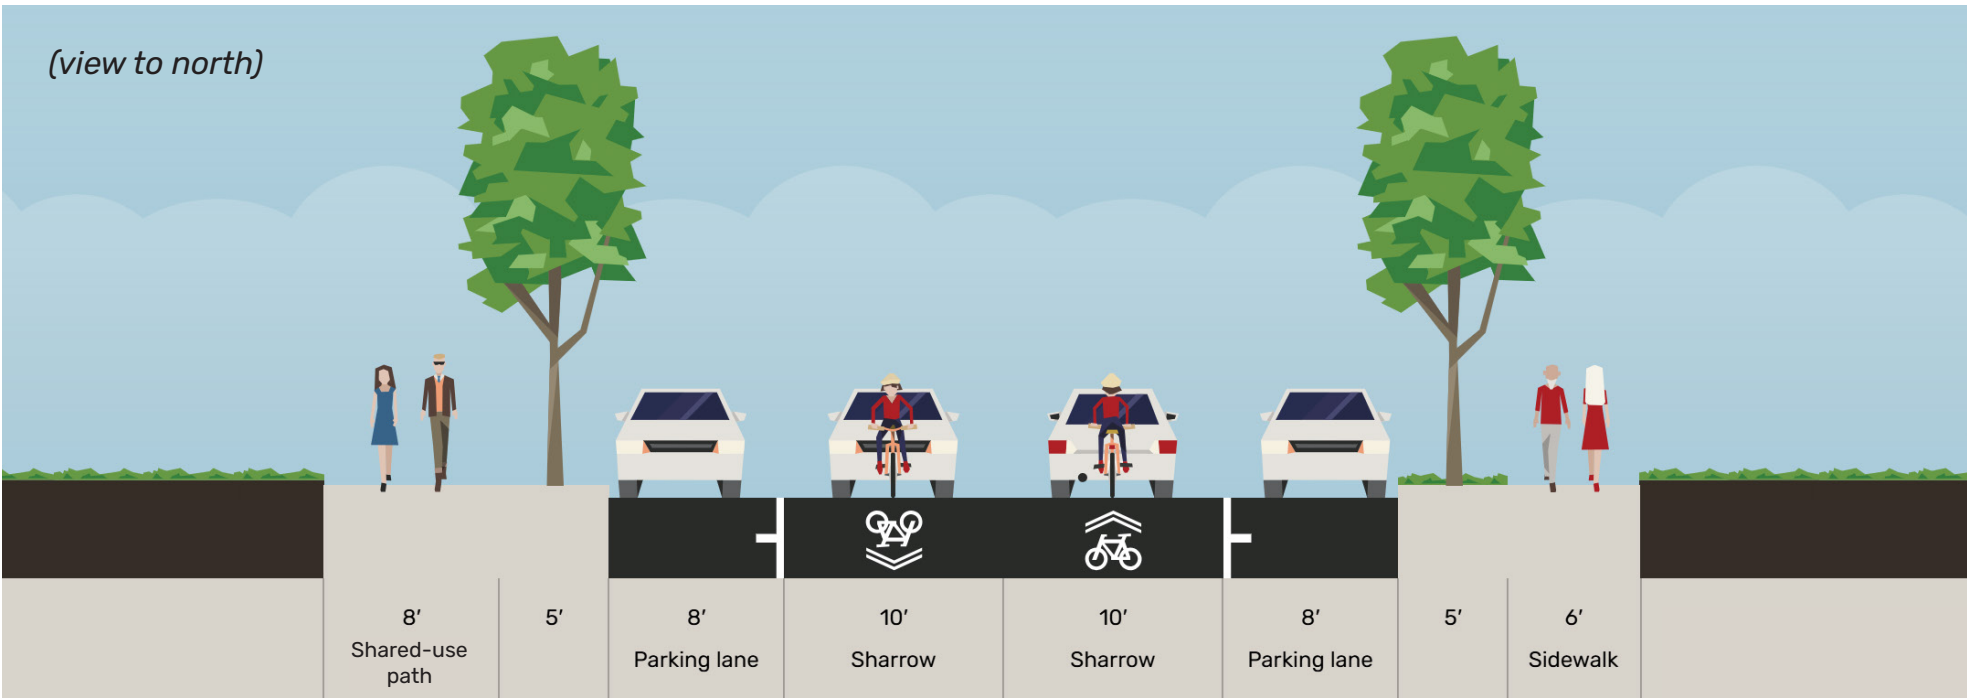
Proposed Typical Cross-Section on Old Highway 77 (60' ROW)
